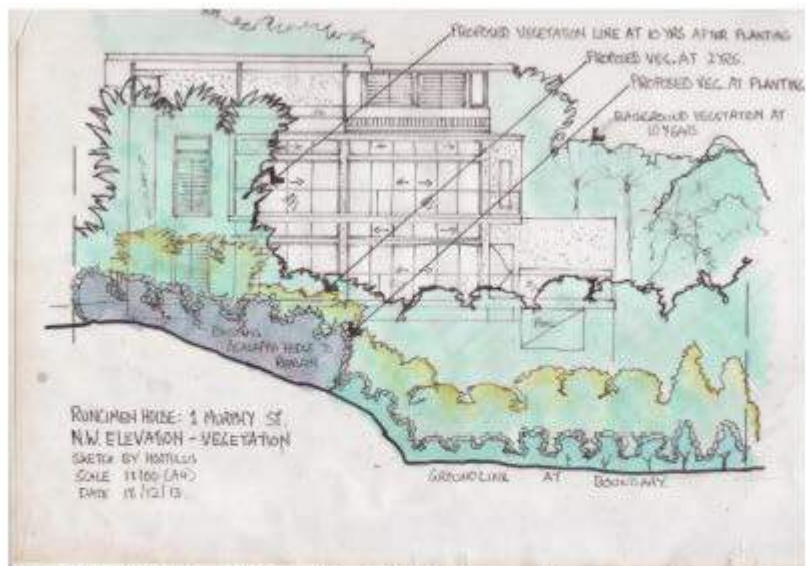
North West Vegetation Elevation at planting, 2years and 10 years.
